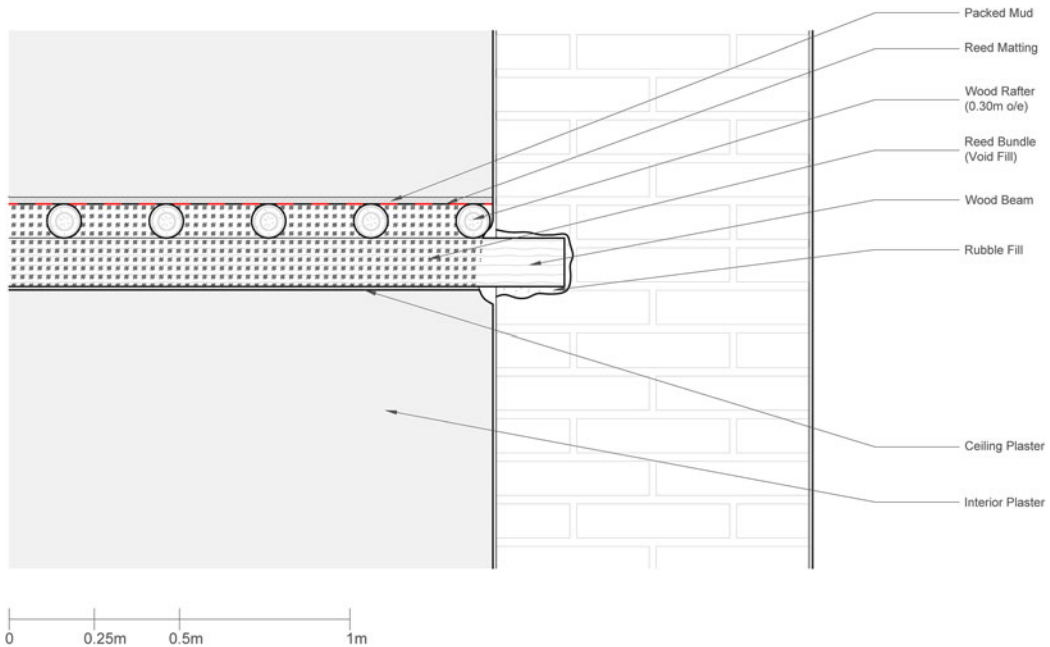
Section detail, showing the construction of the new ceiling above the canopy in Room 6 of the Christian Building (M8-A). (C. Leon Angelo and J. Silver.)
